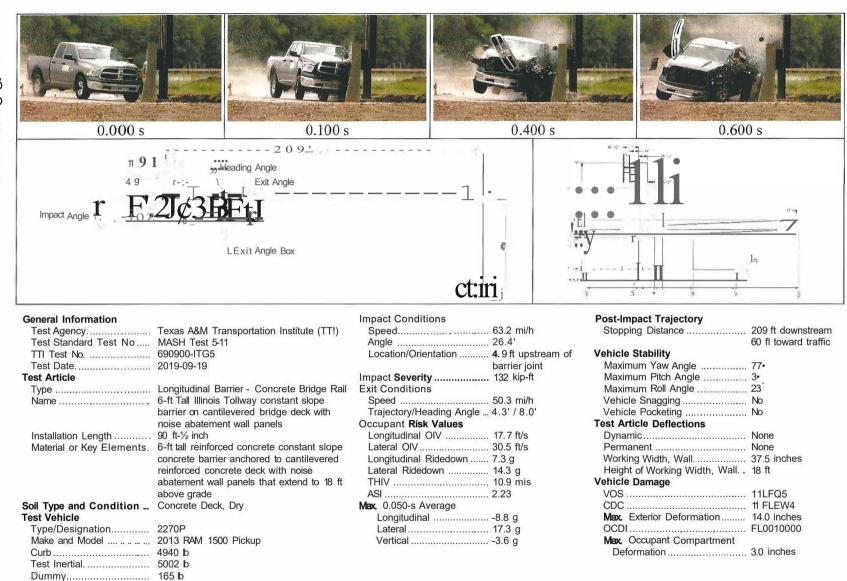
Summar:-,' of Results for *MASH* Test 5-11 on 6-ft Tall Illinois Tollway Constant Slope Barrier on Cantilevered Bridge Deck with Noise Abatement Wall Panels.
